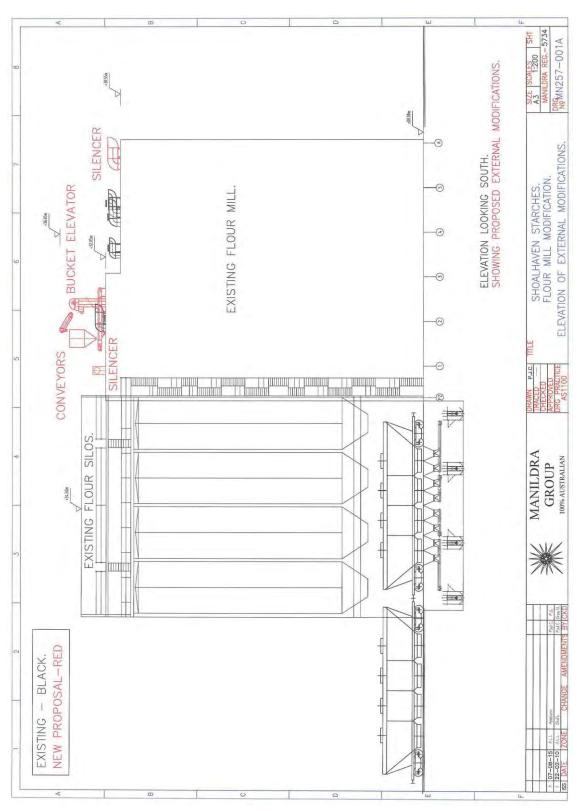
New Equipment on the Rooftop of the Existing Flour Mill
